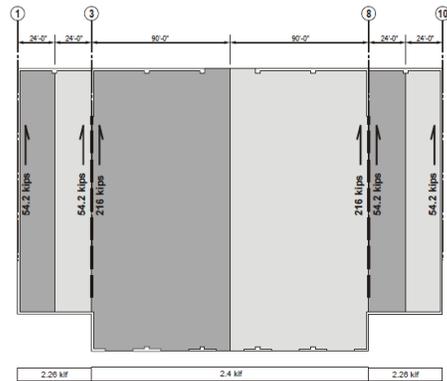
(b) Roof Diaphragm Earthquake Loads in North-South Direction
